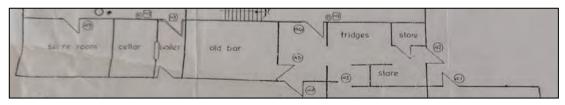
Extract from an undated plan of the current Rooms 16 to 18
